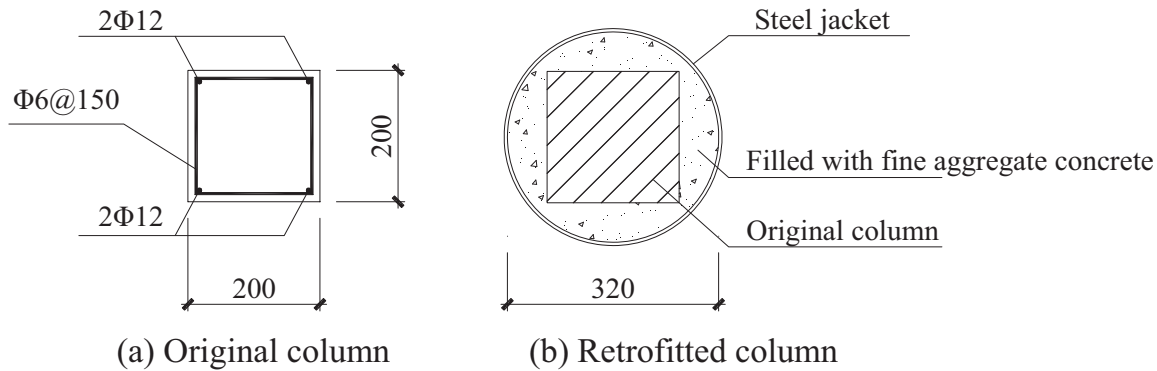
Cross-sections of specimens. (a) Original column (b) Retrofitted column.
